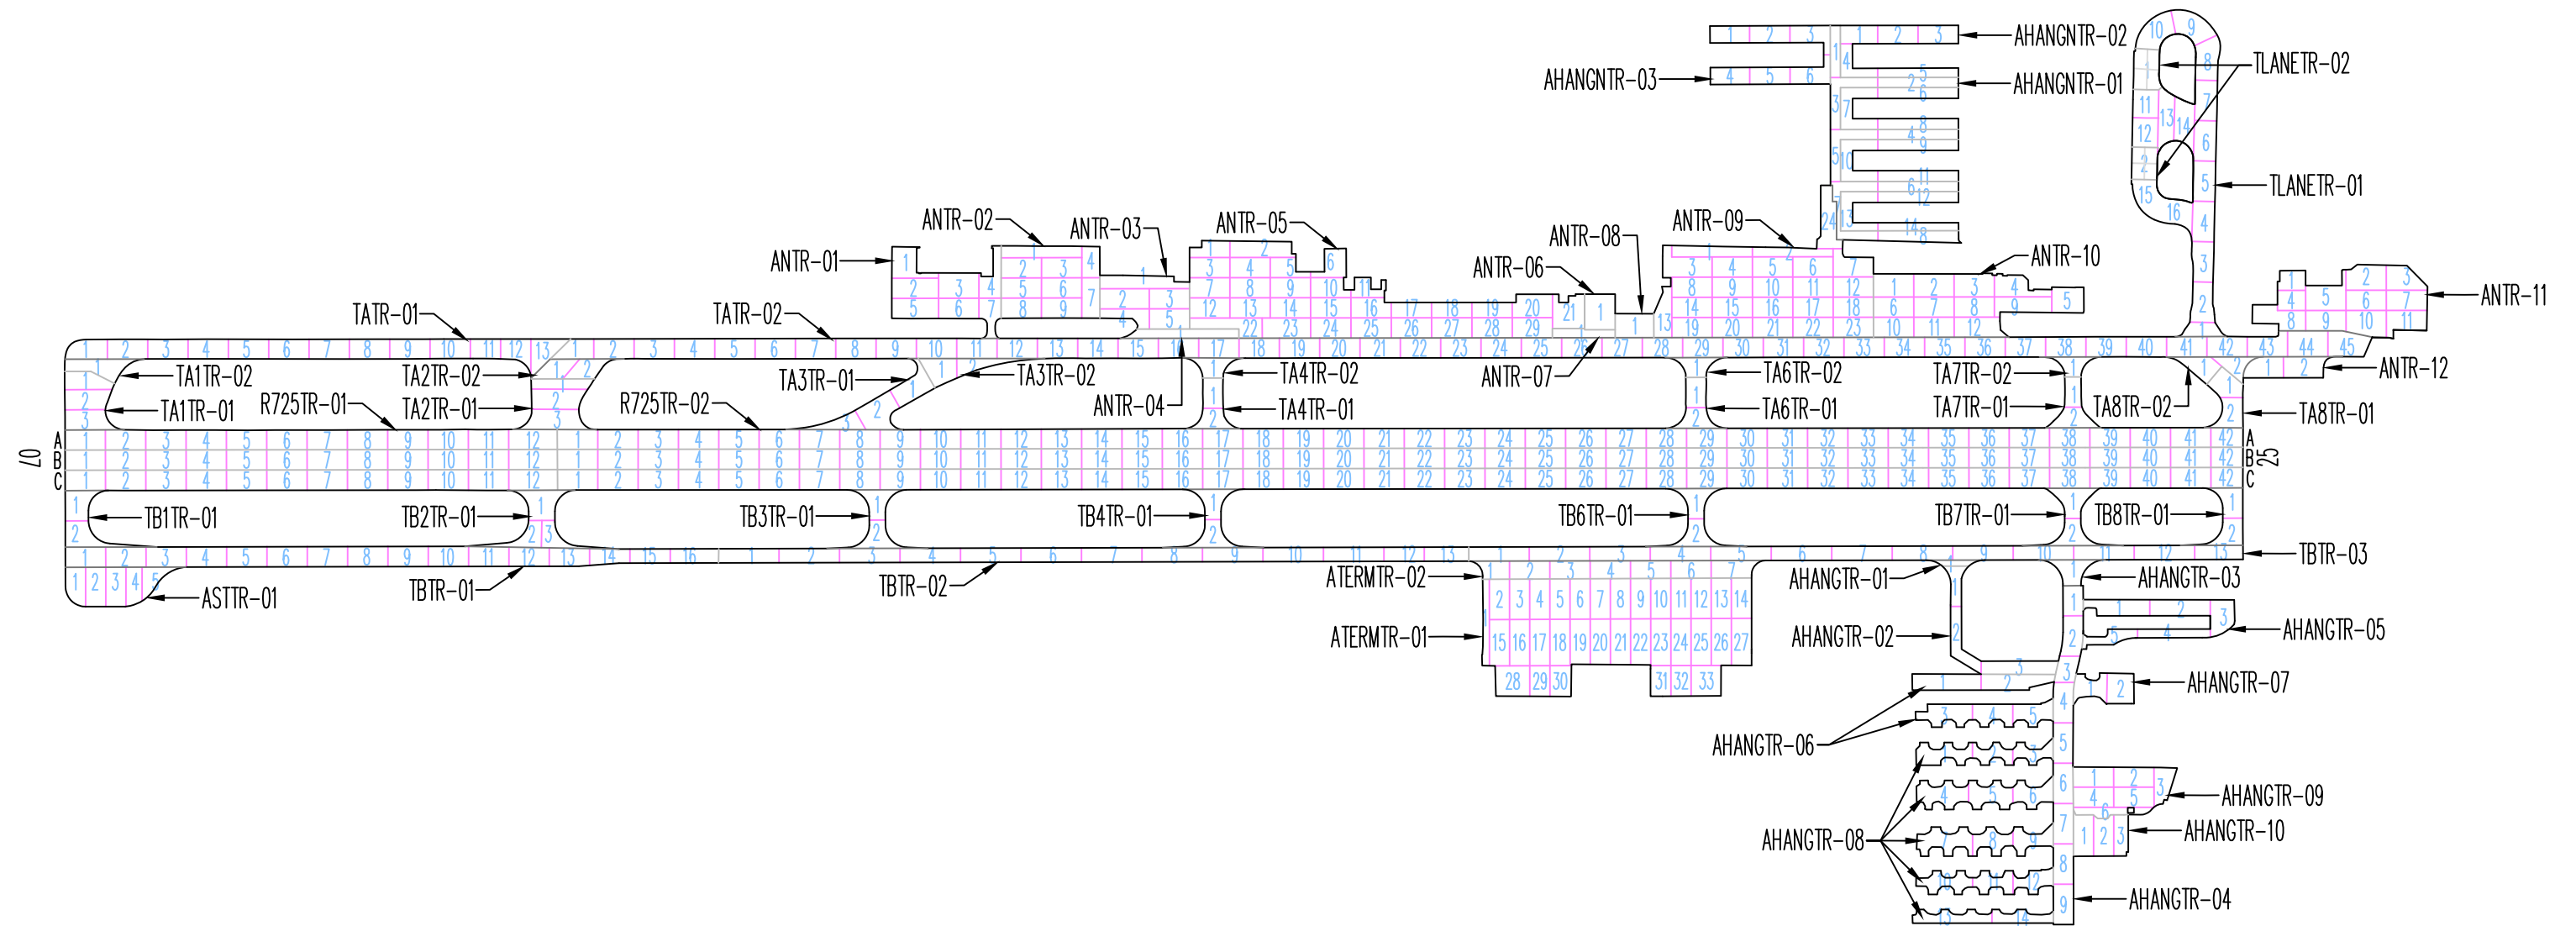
B. Airport Layout, Dimensions and Pavement Cross-Sections – Runway and Taxiways.
